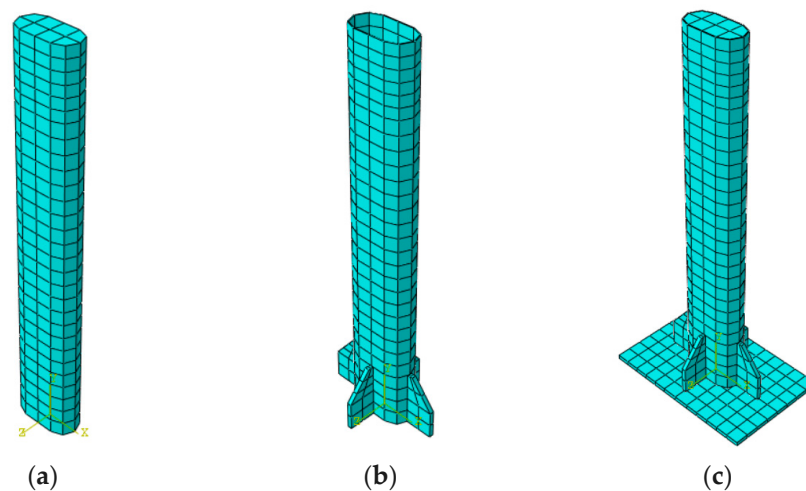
Model element. (a) Concrete, (b) steel tube and stiffener, (c) overall element.
